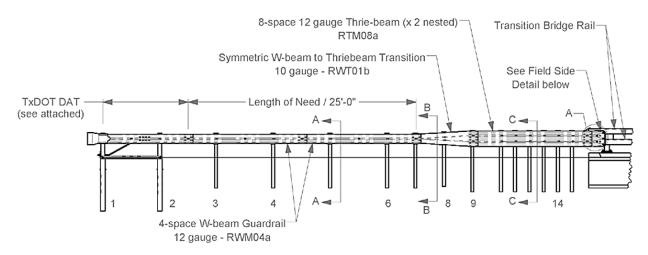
Typical single-sided cross-section of the modified thrie beam guardrail system tested by MwRSF.
